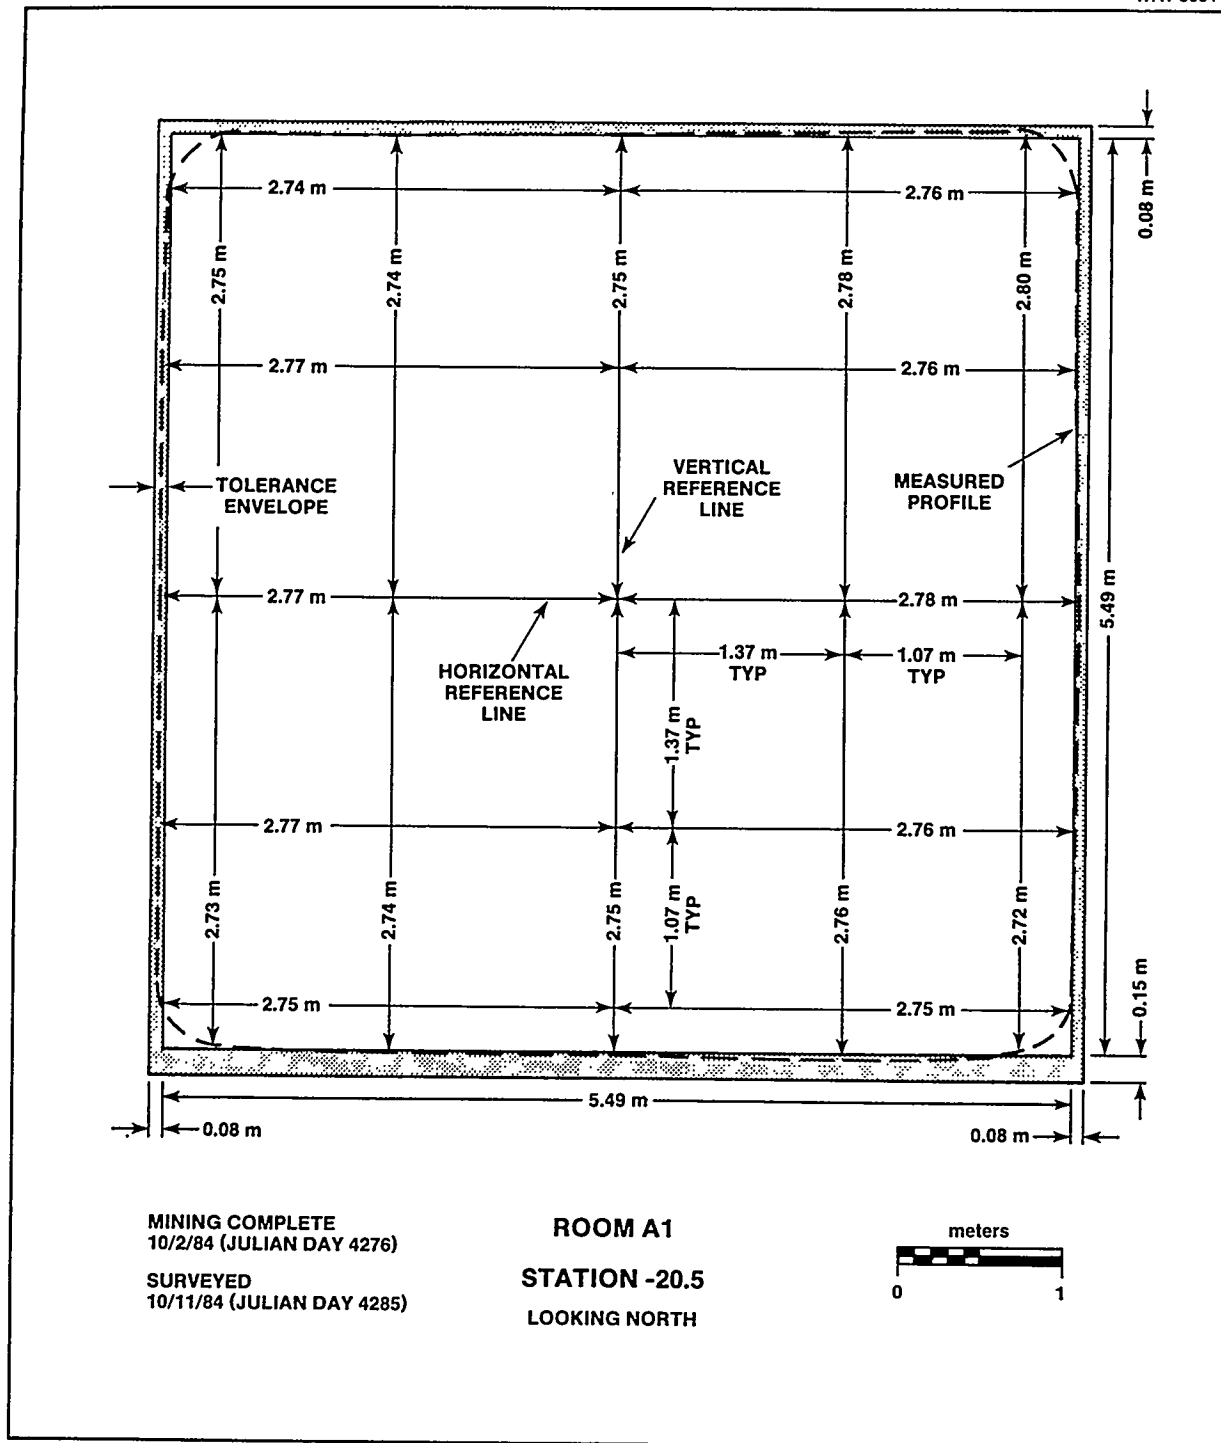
As-Built Cross Section of Station -20.5 m, Room A1
